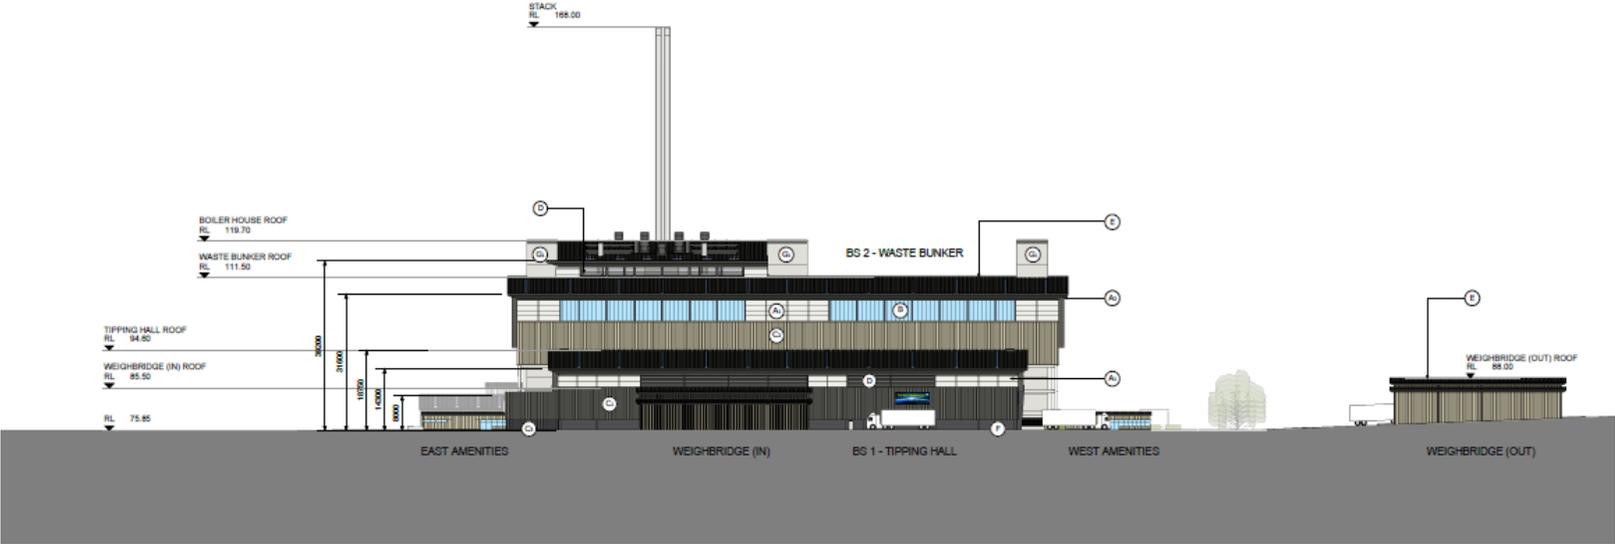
Southern Elevation (source: Krikis Taylor Architects, 2017)
